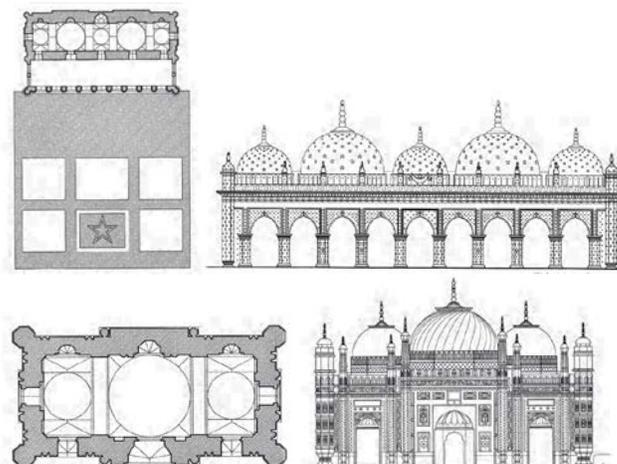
Plan of and Front Elevation of Tara Mosque at Old Dhaka, Plan and Front Elevation of Bazra Mosque at Noakhali.
